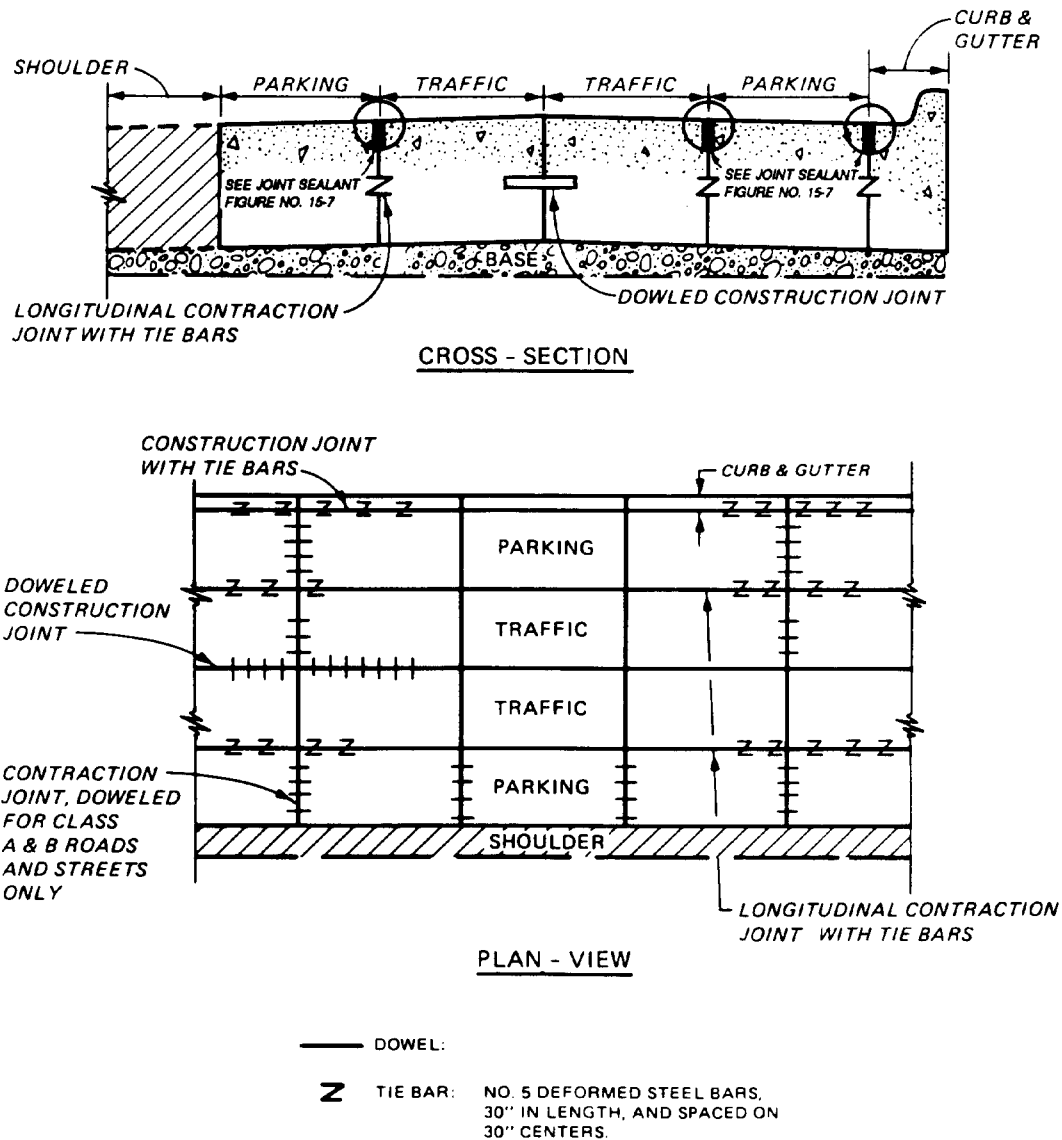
Design Details for Plain Concrete Pavements. (Sheet 2 of 2)
